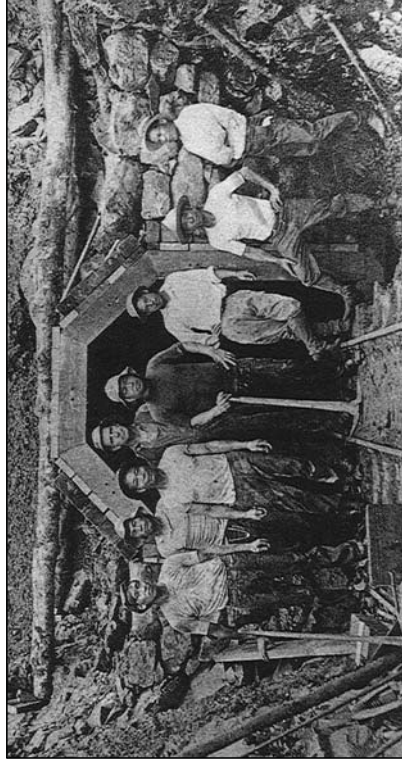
Workers at the Waiahole Tunnel, ca. 1916 (Wilcox 1996:107)
